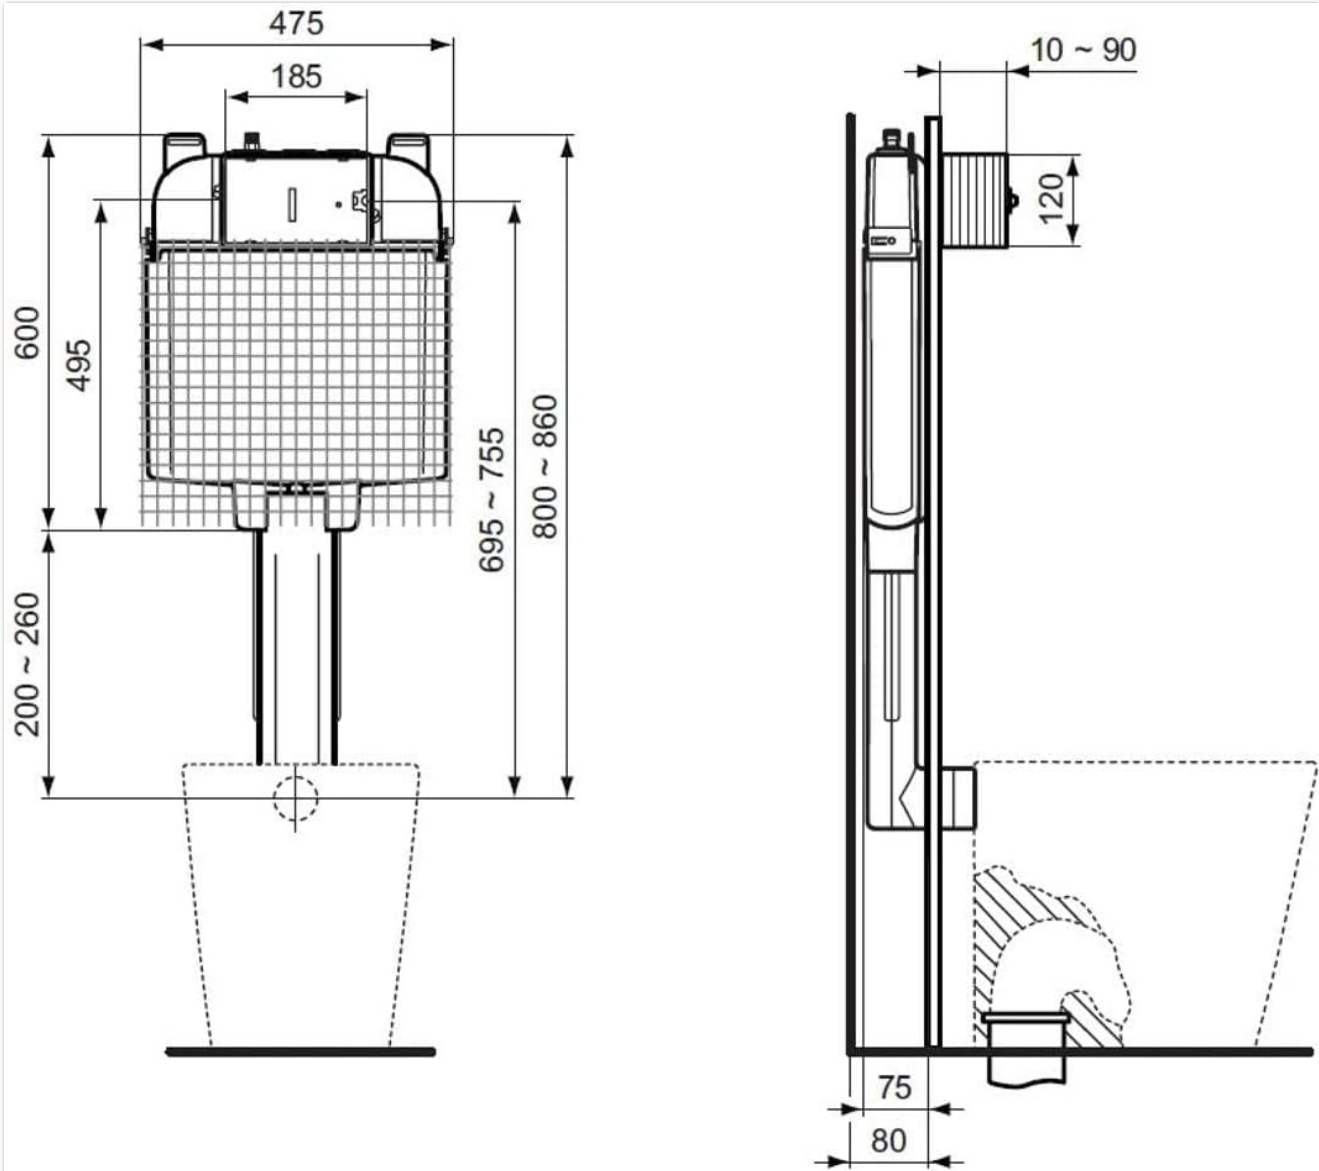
Technical drawing illustrating the dimensions and installation clearances for the PROSYS 80 in-wall cistern, showing front and side views with measurements in millimeters.
